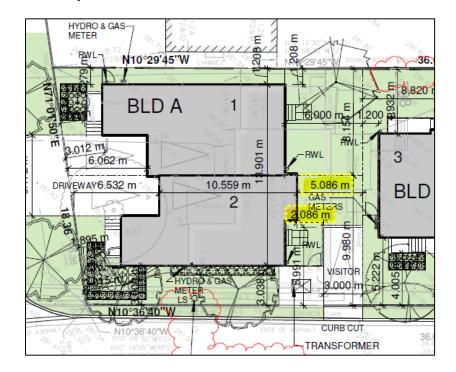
Proposed Rear Yard Setback – Semi-Detached Dwellings
